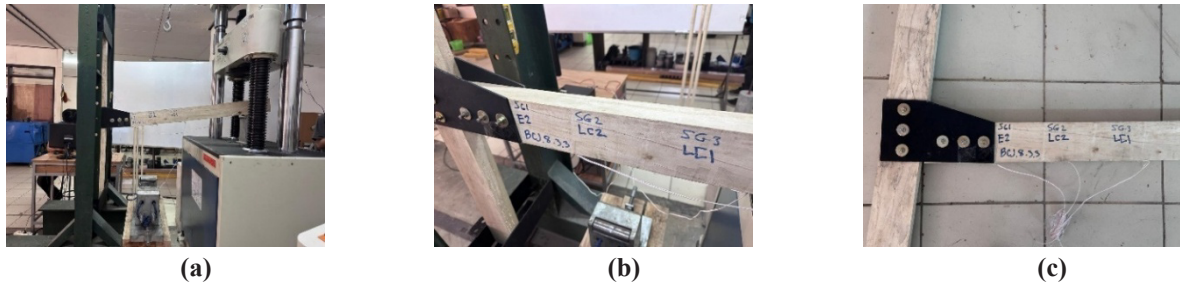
Setup, Testing, and Post-Test of the Beam-To-Column Specimens Using 8 mm Diameter of Bolt. (a) Setup of the Specimen. (b) Testing of the Specimen. (c) Post Test of the Specimen.
